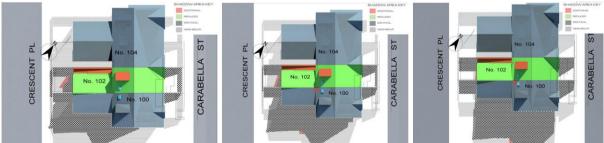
Shadow Diagrams at 12.00 pm (left), 1.00 pm (centre) and 2.00 pm (right) detailing shadow cast from the dormer affecting the roof of the attached dwelling and partly over the roof of 100 Carabella Street (SD05-07 Rev 01)
